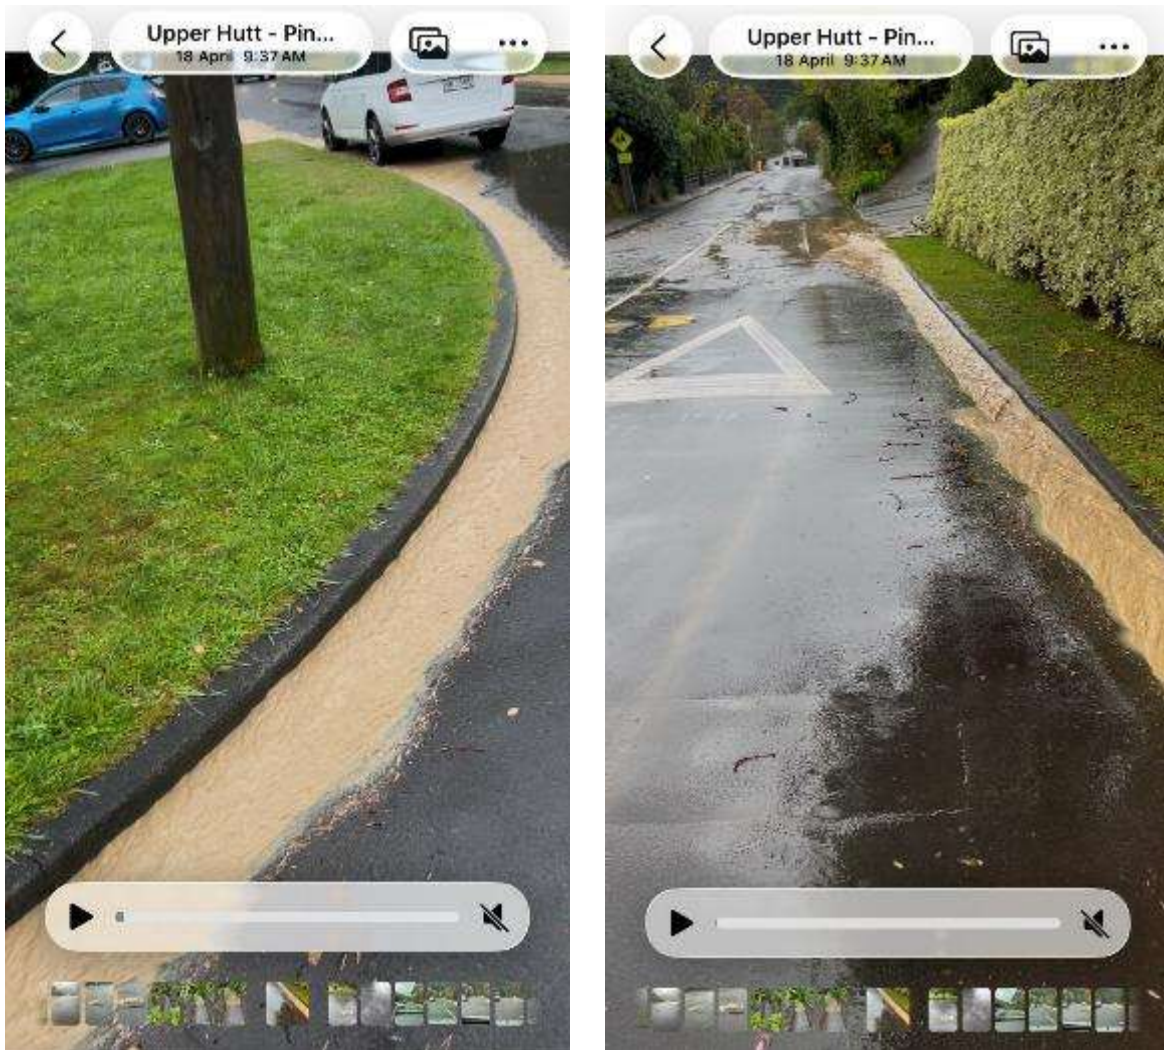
Water from Pinehaven Road entered Forest Road, 18 April 2026, 9:37am
